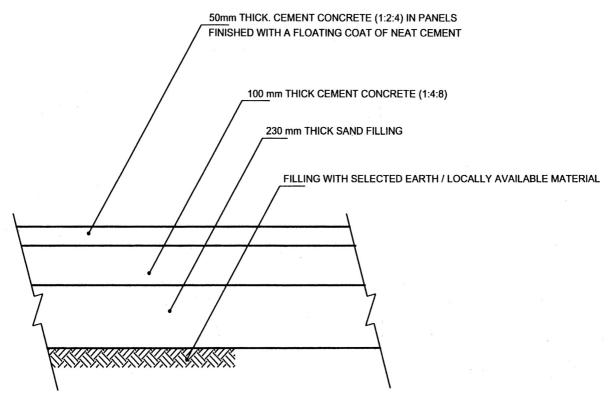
DETAILS OF FLOORING (MAIN GODOWN)
